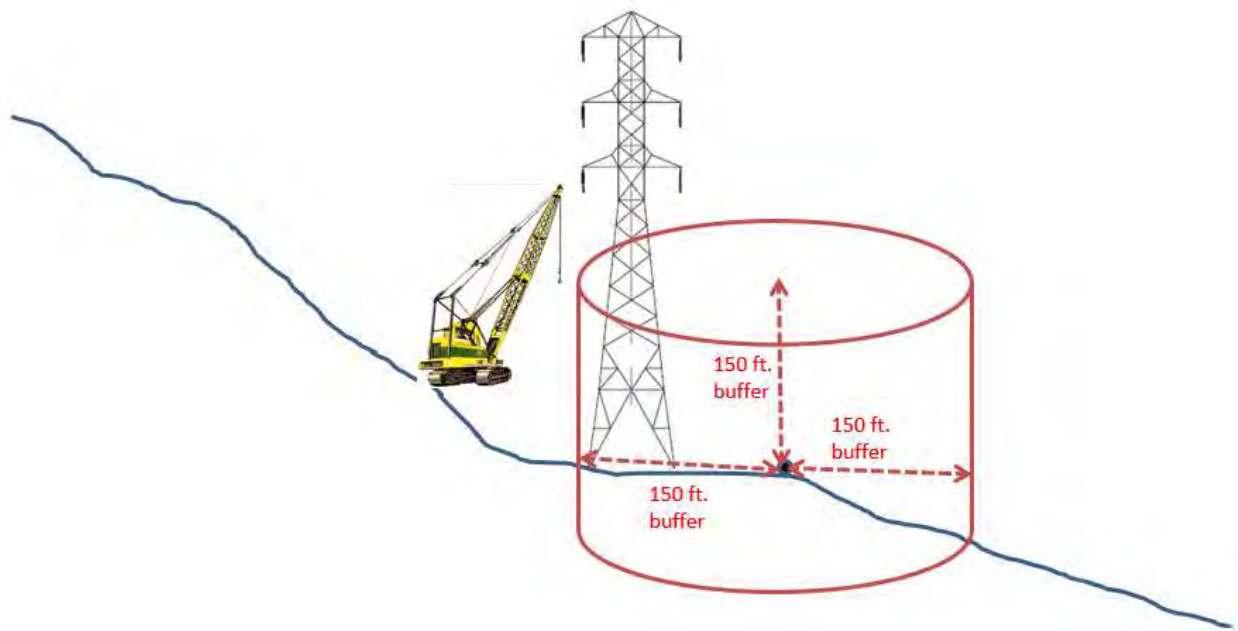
Example of Cylindrical Ground Construction Buffers for a Nest Nearby Construction Activities
